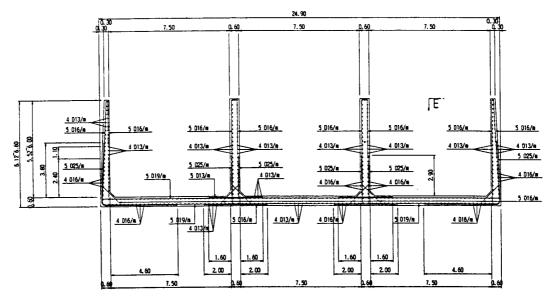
Arrangement of Reinforcement for Discharge Tank
